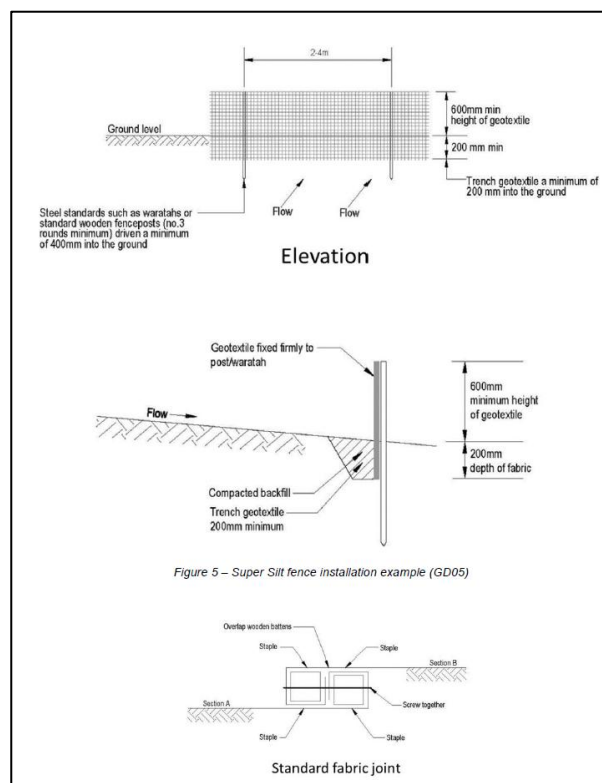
Silt fence geotextile lap joint (source: esc canterbury guidelines).
